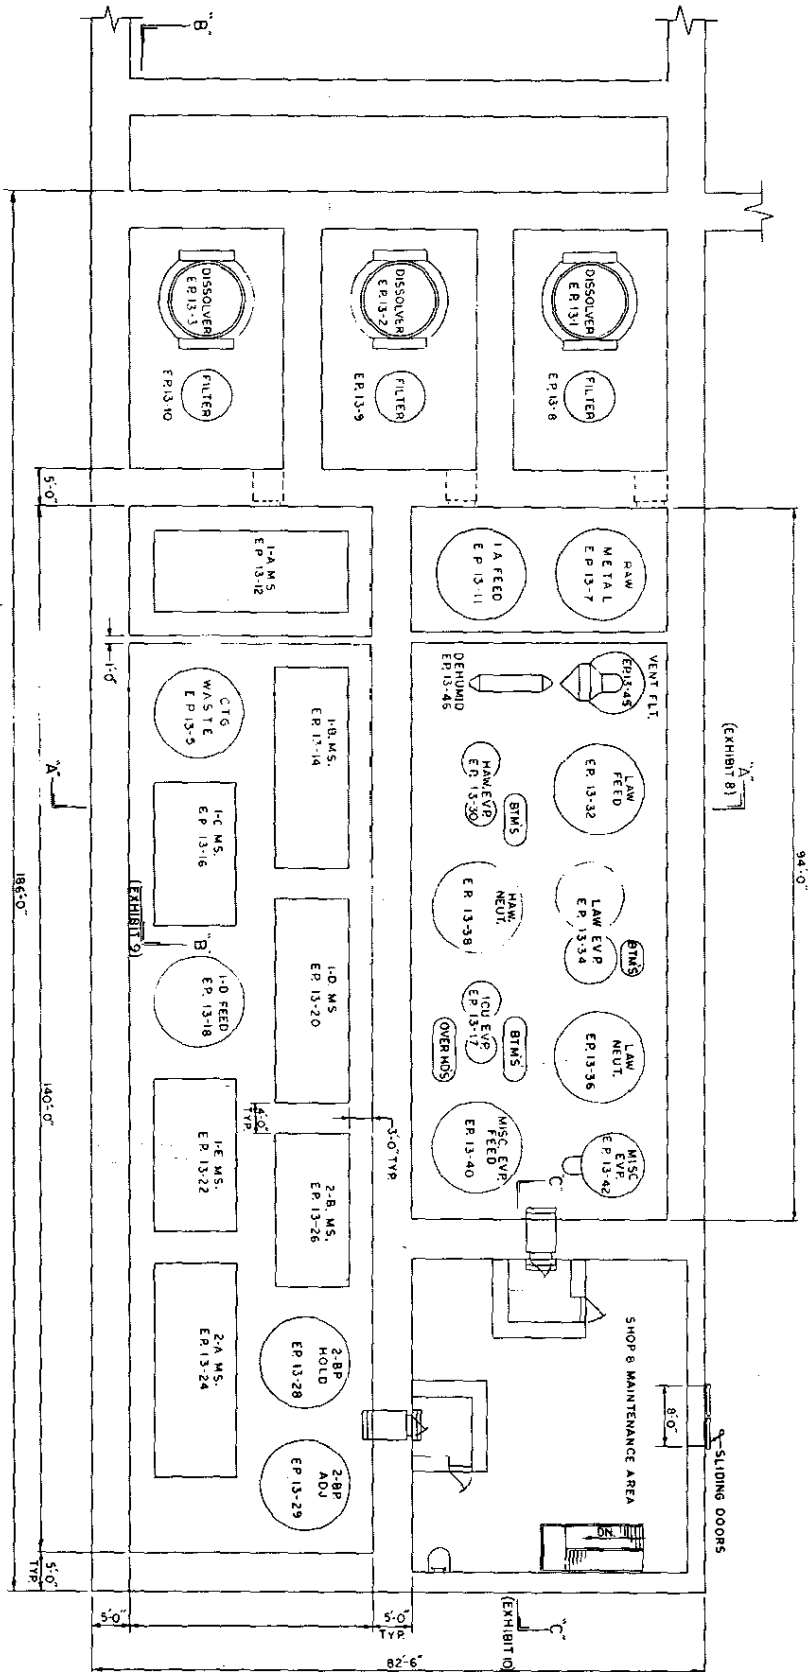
CASE VII - BUILDING NO. 13 CANYON ARRANGEMENT
